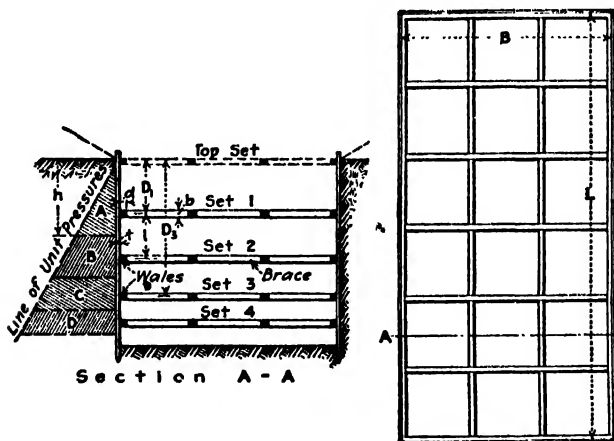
Plan, Section and Outside Pressure Diagram of Single-Wall Cofferdam.
